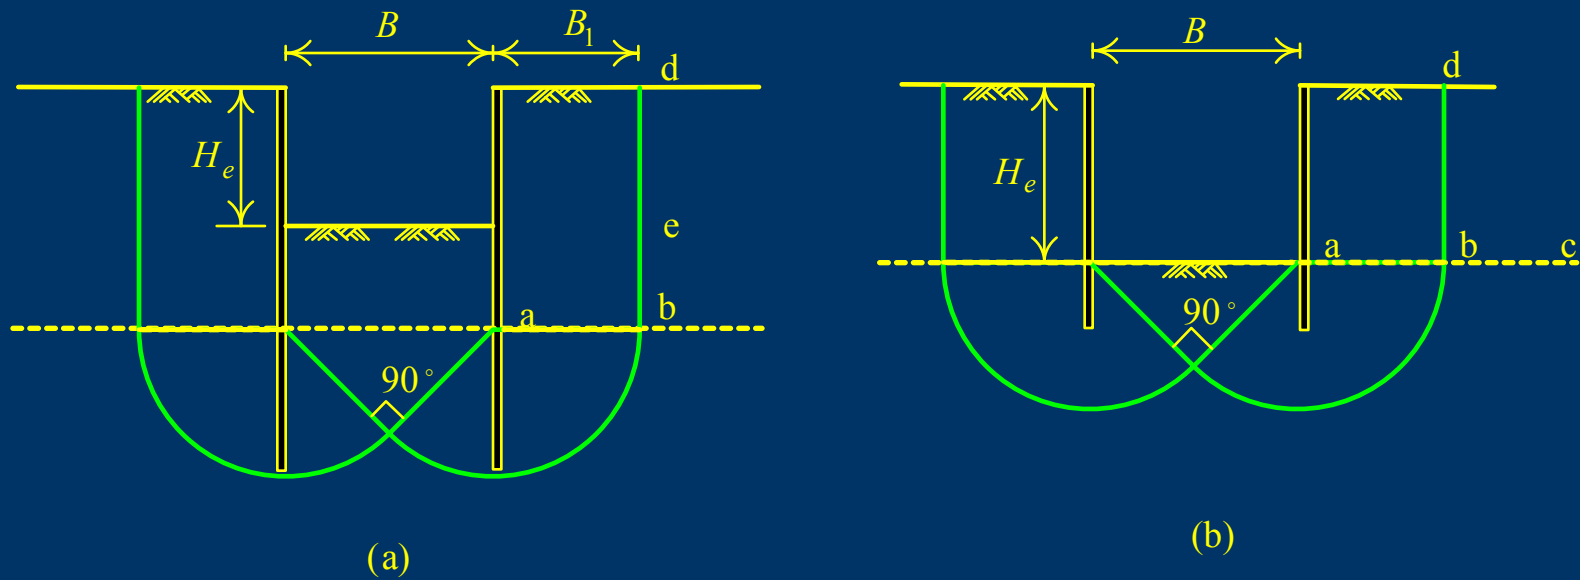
Relation between the embedded part of the retaining wall and the failure surface
